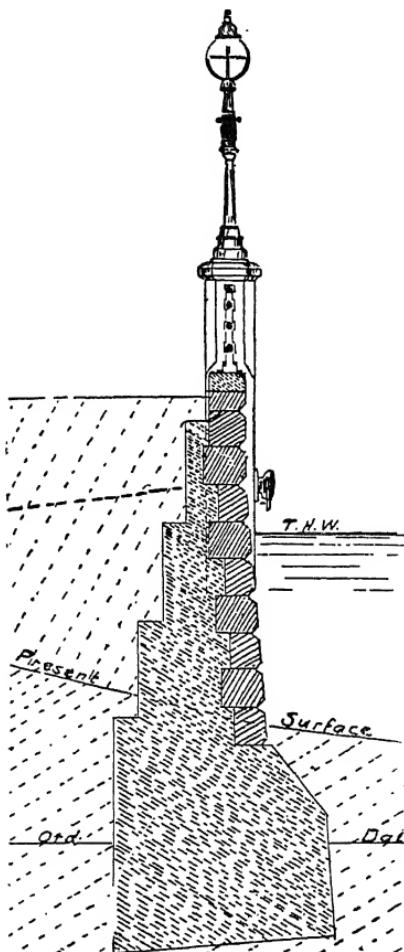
River-Wall at Fulham faced with Concrete Blocks.
